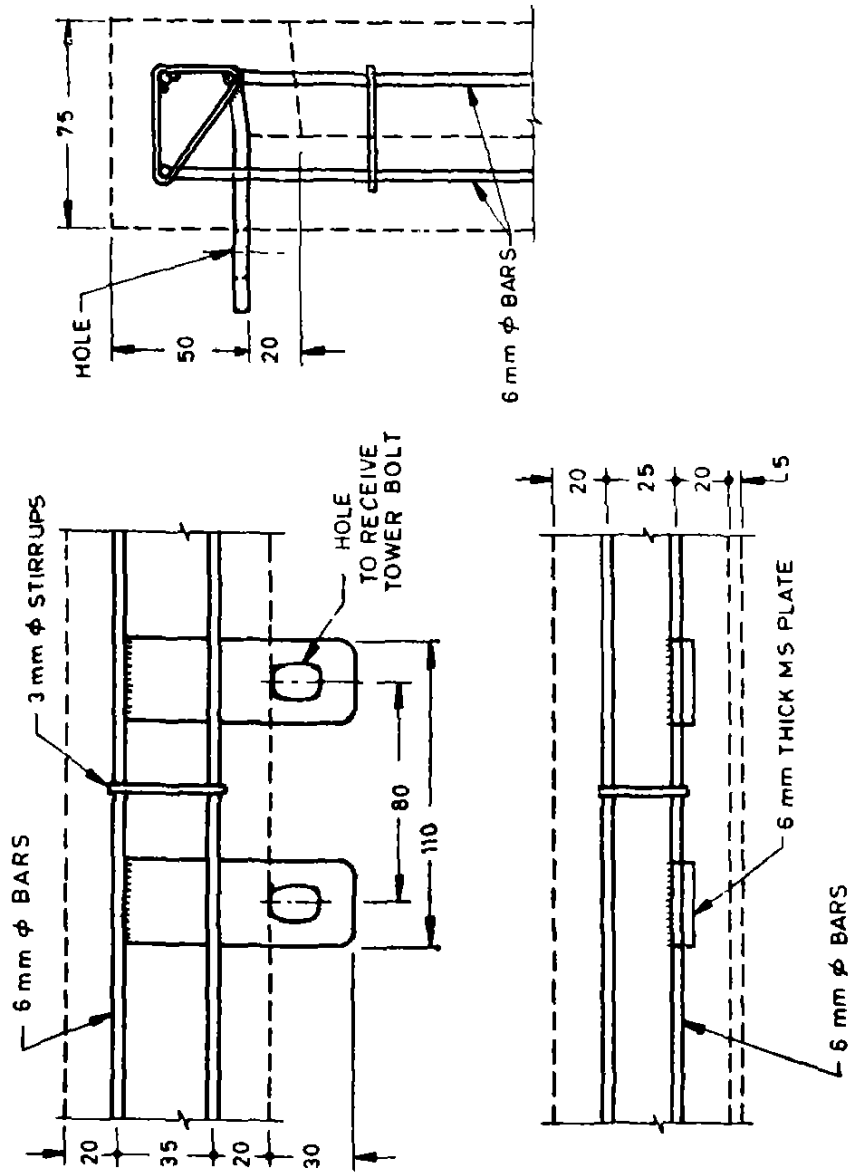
METHOD OF FIXING TOWER BOLTS TO RCC FRAMES
